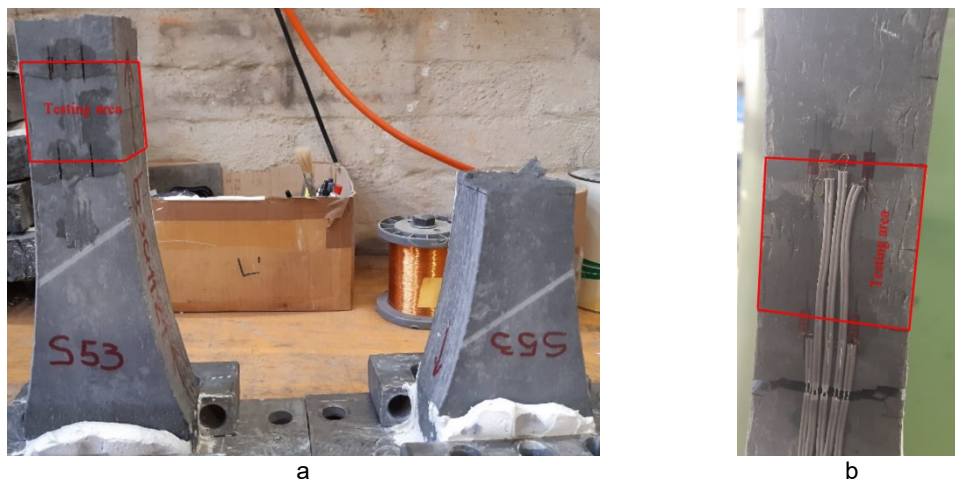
View of the specimen S53 (a); and specimen S59 after failure (b)
